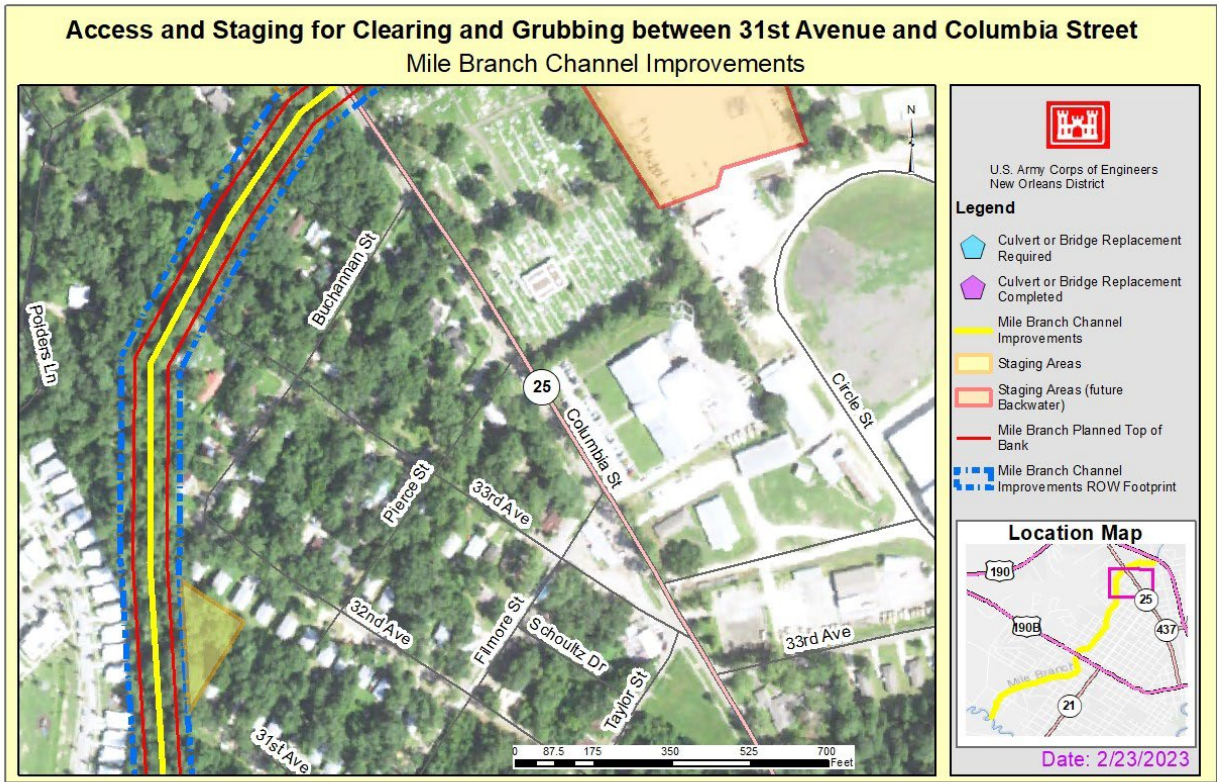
2-2. Access and Staging for Mile Branch from Columbia Street to 31st Avenue
